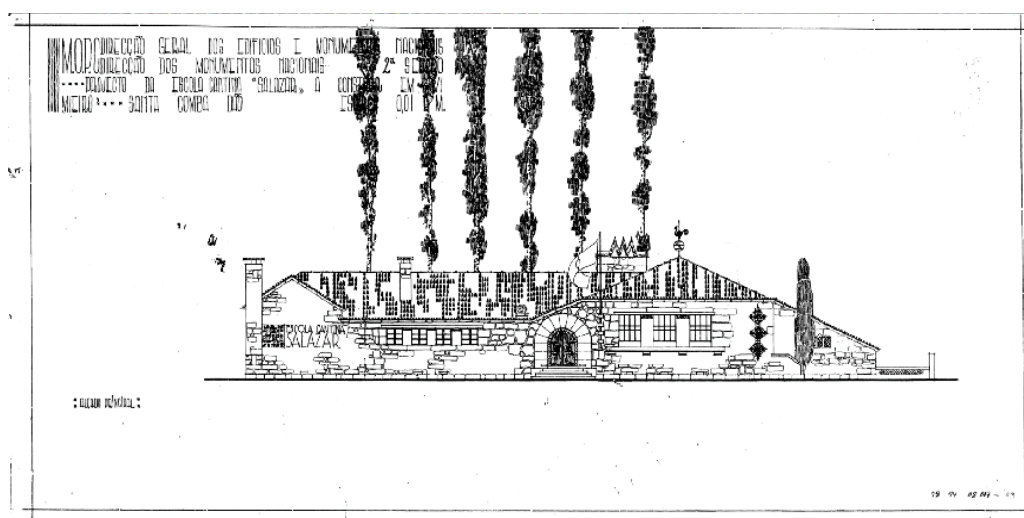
Escola-Cantina Salazar (Salazar School-Canteen). Vimieiro, Santa Comba Dão. Main elevation. DGEMN Archive: SIPA, IPA nº PT021814080009, Desenho.009487.
